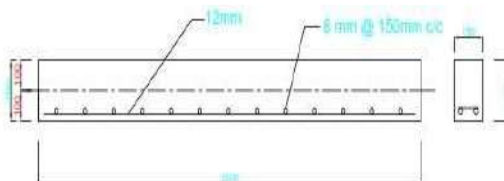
CONFINEMENT ZONE REINFORCEMENT DETAILS
